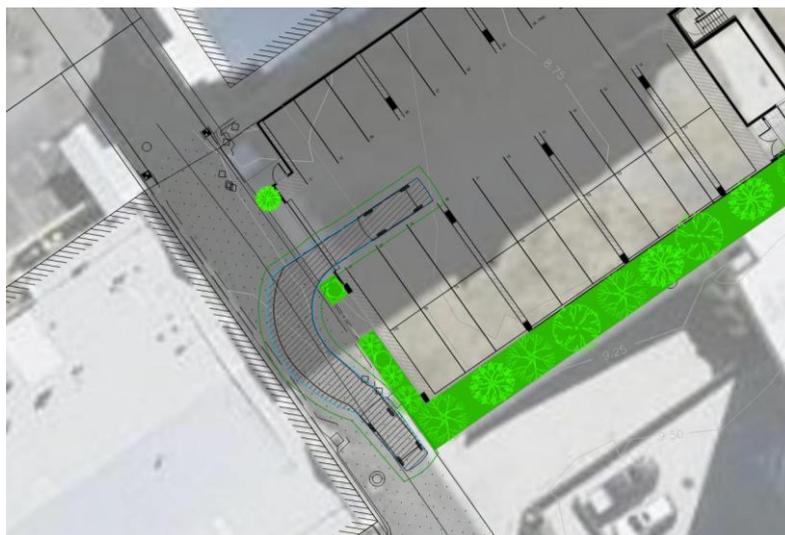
Access Separation (Source: Architectural Site Plan Issue A with JS² Comments shown in red)
